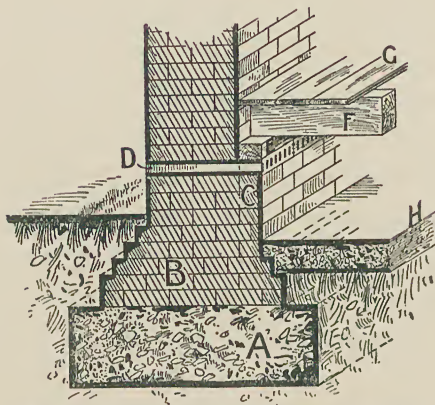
Brick and Concrete Foundation for 18-inch Wall.
